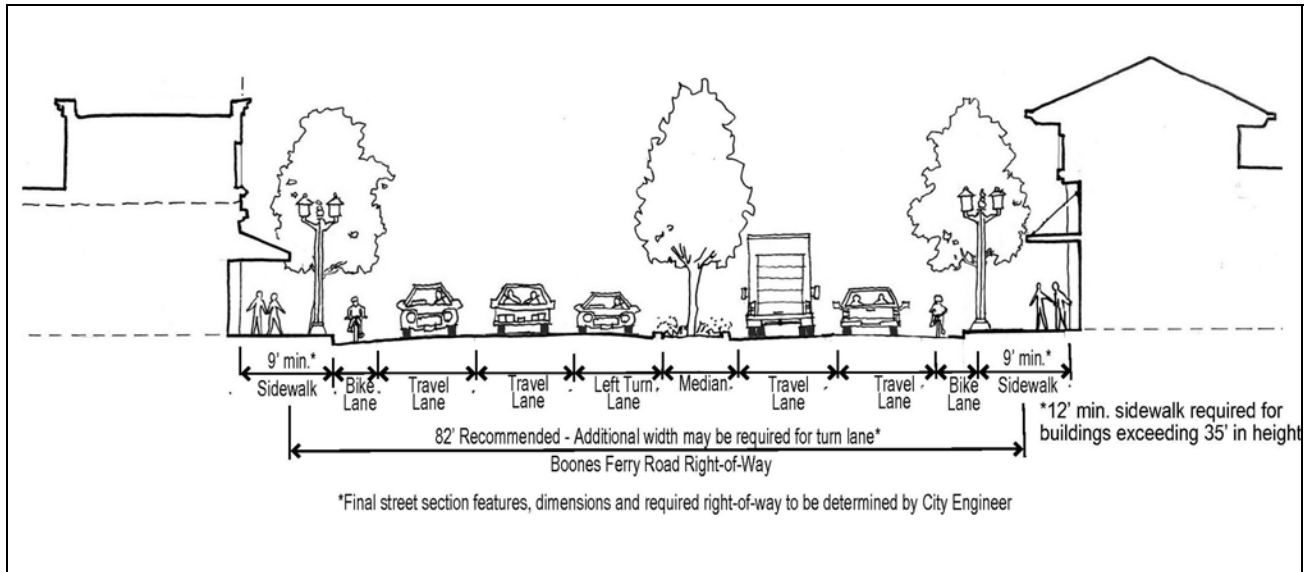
Y: Boones Ferry Typical Mid-Block Street Section
